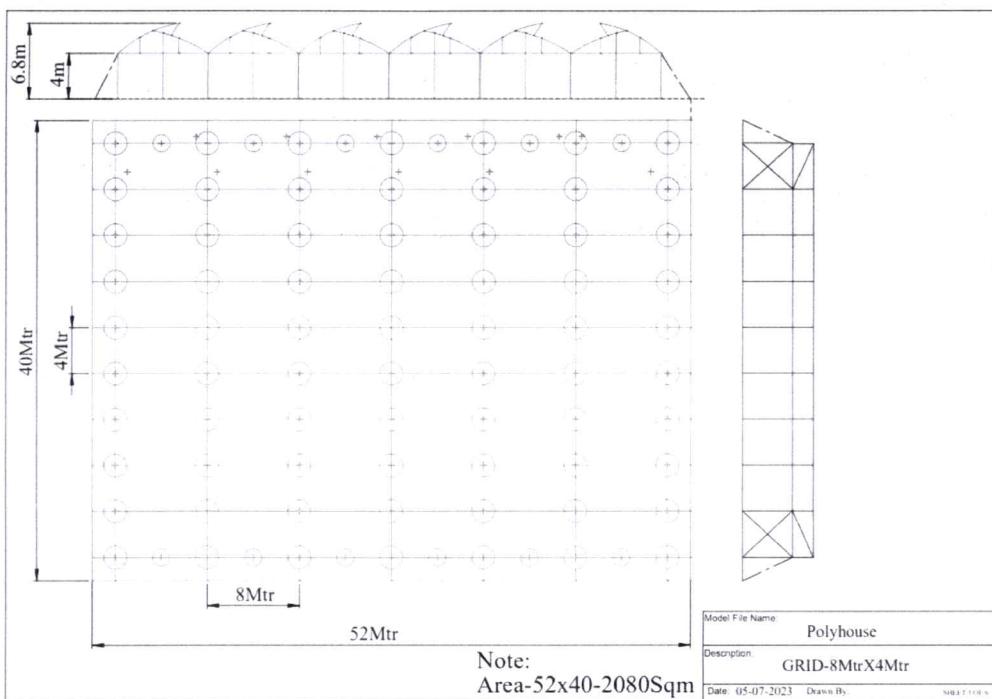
Design of Polyhouse where Hydroponics systems would be installed.
